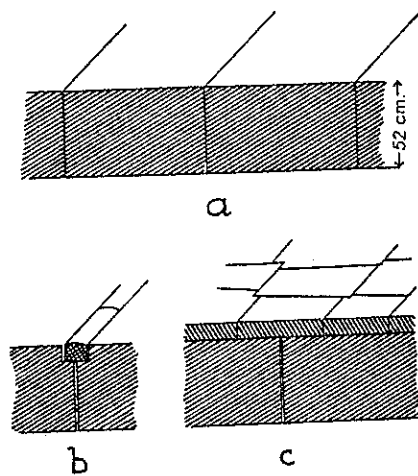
DETAILS OF ROOF CONSTRUCTION IN THE SMALL TEMPLE: (a) TIGHT JOINTS, (b) LOOSE JOINT WITH STONE FILLER SET IN GYPSUM, (c) THIN STONE PAVEMENT, SET IN GYPSUM, SUPERIMPOSED IN THE PTOLEMAIC PERIOD
